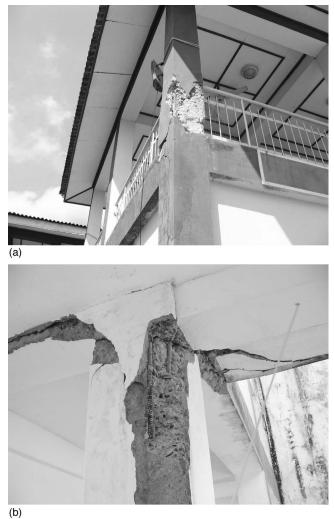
The Nabagram *panchayat bhavan* building was shaken by two earthquakes—on 14 September 2002 and 26 December 2004. Severe cracking and damage were observed in the soft first-story columns, and columns in the first story that were primarily damaged in the 2002 earthquake because of "missing" ties were now more severely damaged in the 2004 earthquake, even though they had apparently been "retrofitted" (photo: D. Rai).
